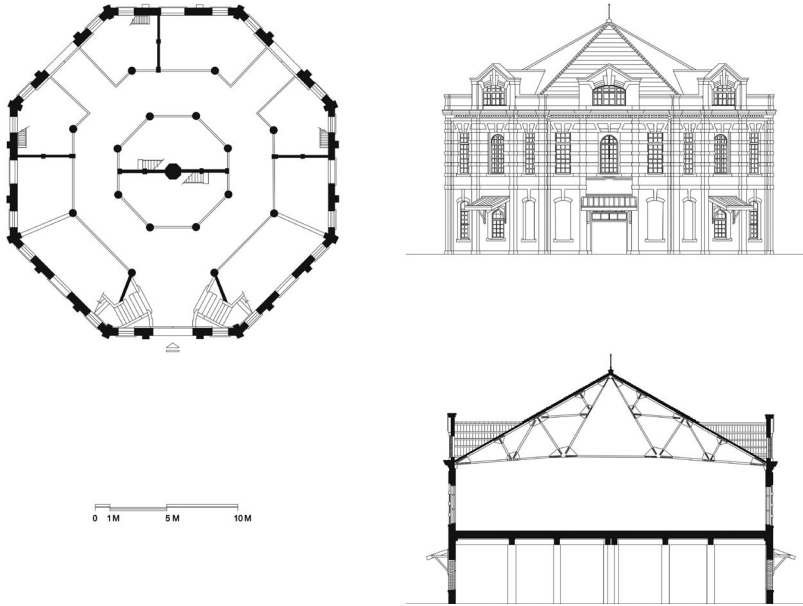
The plan, façade and section of the Octagon Building before the fire.
